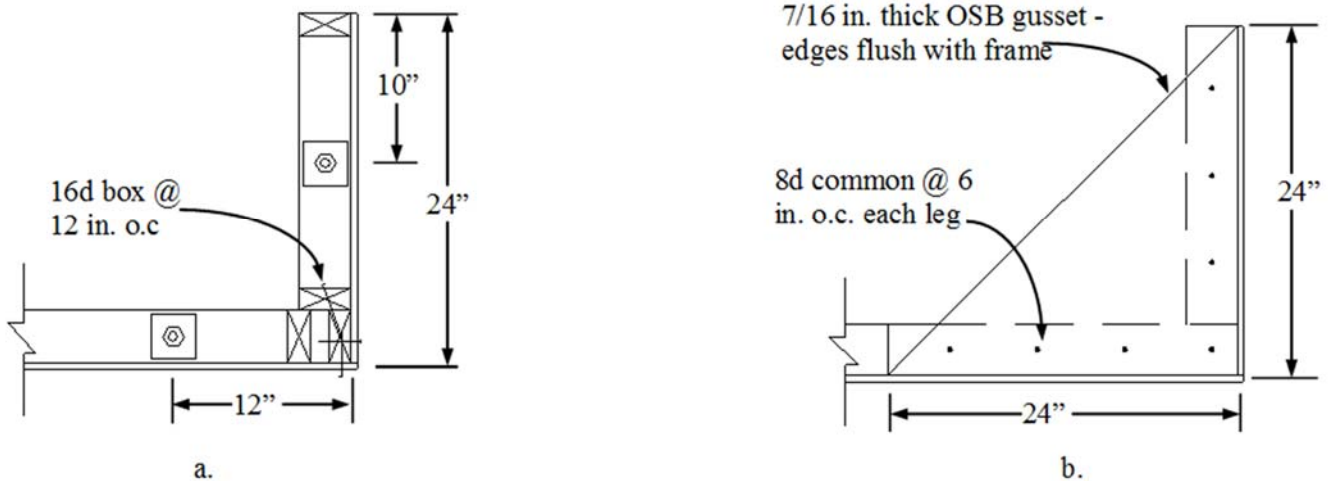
Wall Type 2 Corner Return, a) Location of Bottom Plate Anchor Bolts, and b) Attachment of Triangular OSB Gusset to Wall Top Plates.
